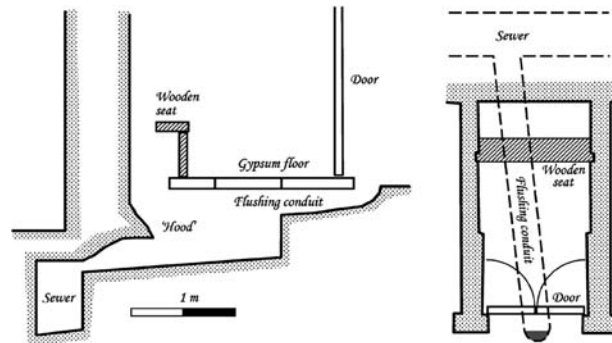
Section and plan of ground-floor toilet in the Queens' department in the palace of Minos, Knossos, Crete (adapted from Angelakis *et al.*, 2005; Graham, 1987).
